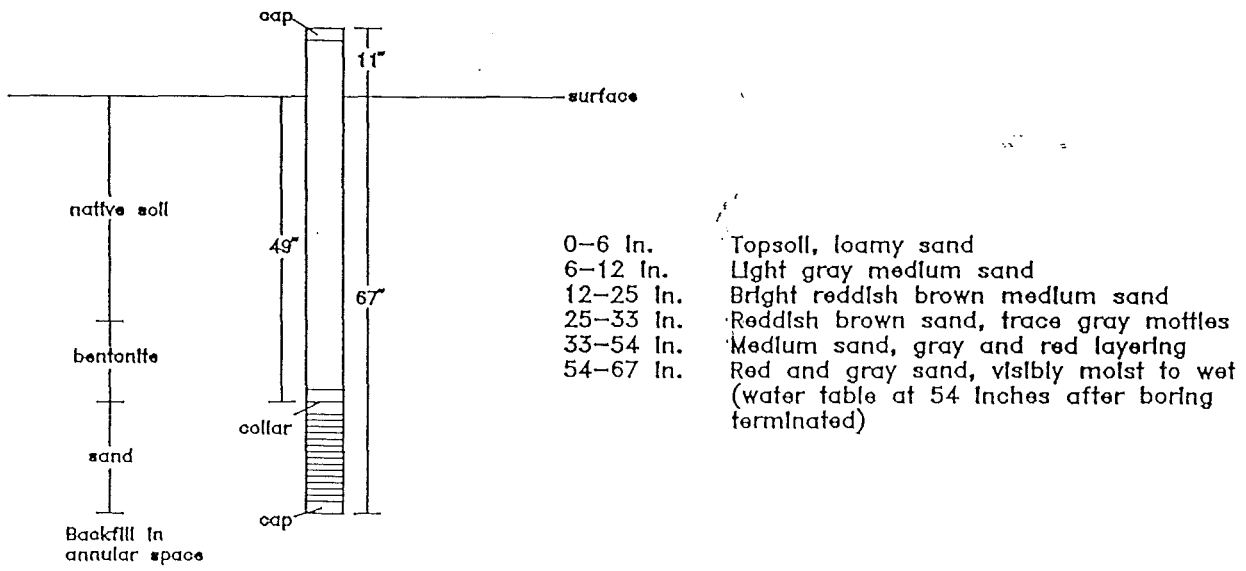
Piezometer 2 (P-2) construction details with associated soils information.
